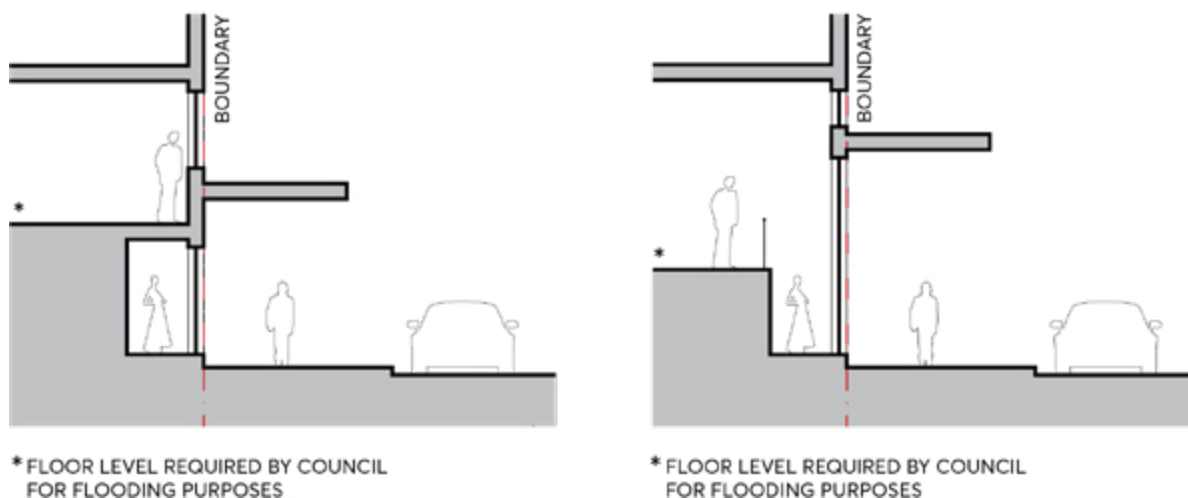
Active Ground Floor: Floor level required greater than 1.5m above footpath level
